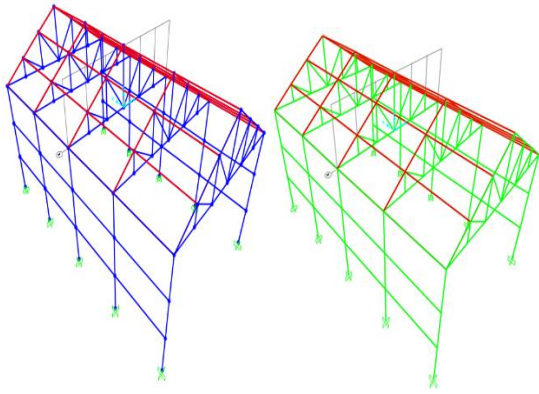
3D view of Howe bottom truss with steel or with cold formed steel
